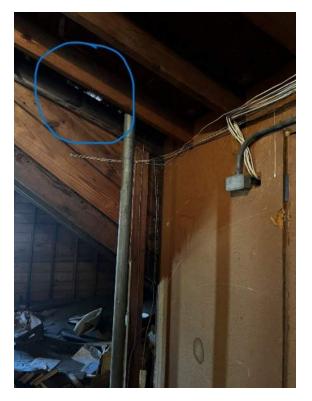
IMG_1579 – Light is visible from below roof framing to exterior.
